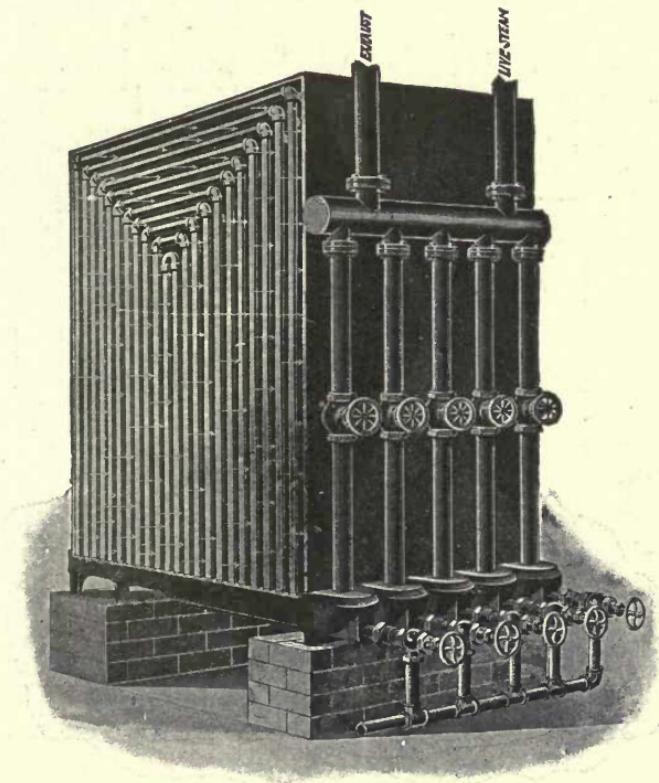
Large Coil-Pipe Radiator Encased in Sheet-Steel Housing.
